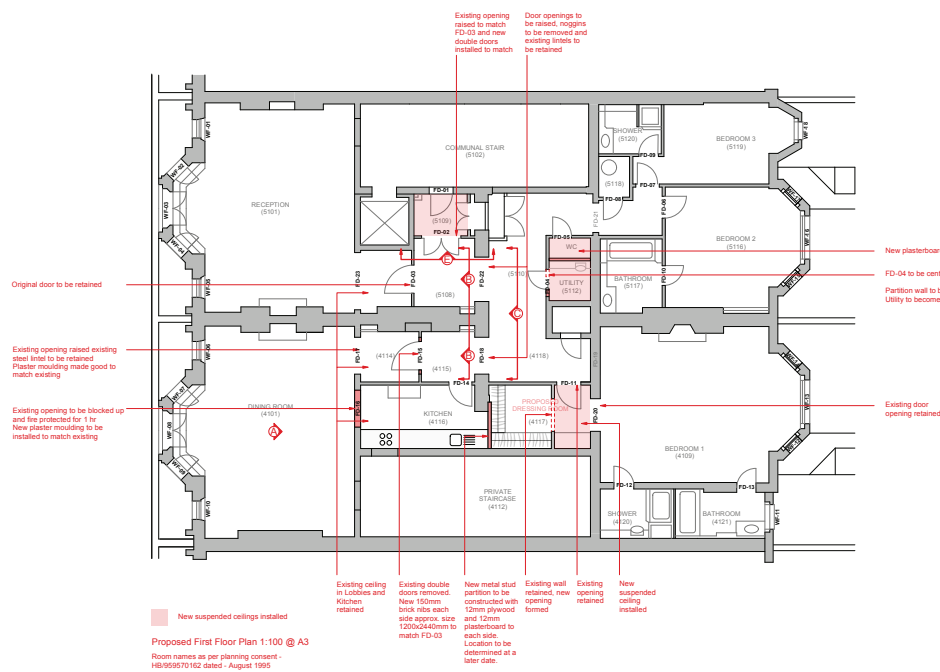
Proposed Plan of Flat 2, 5 Cambridge Gate
